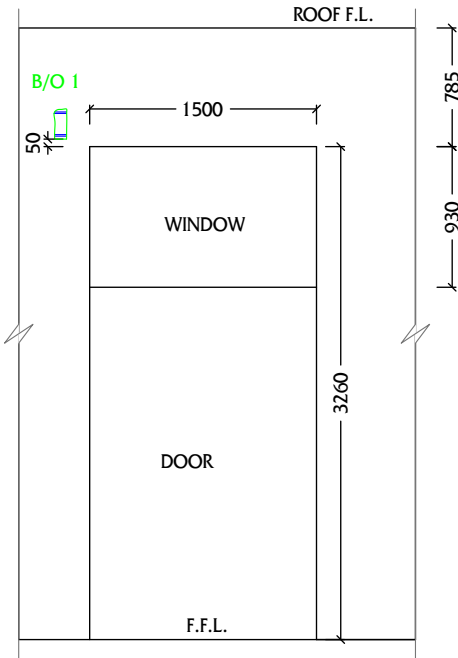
PART SECTION LOOKING WEST THROUGH BEAM - SURVEY AREA C/10-11 SCALE 1:5
